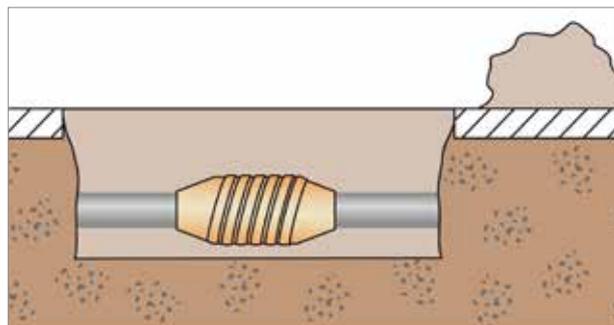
Installation of RAUTITAN system below ground with PINC™ fittings wrapped with corrosion protection system
